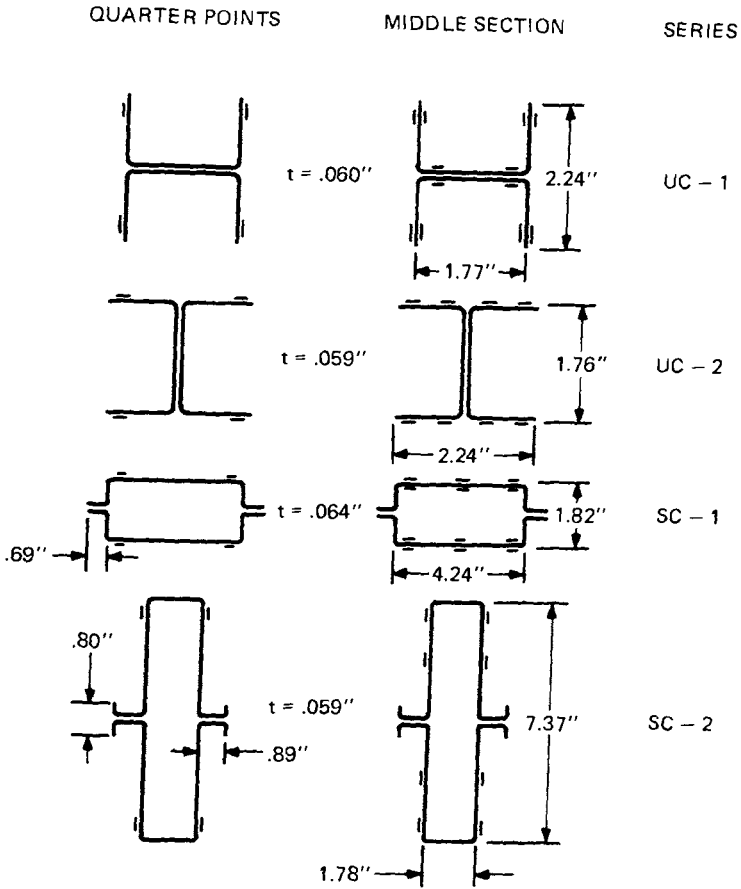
Section configurations, dimensions, and strain gage location for pin-ended column tests.
